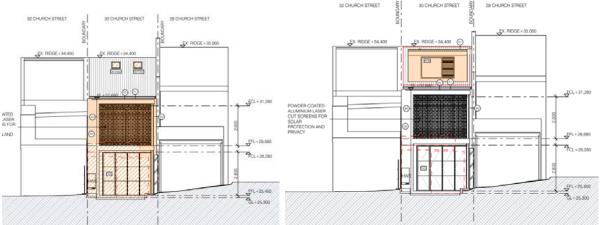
Approved Rear Elevation (left) and Proposed Rear Elevation (right) at 30 Church Street.
